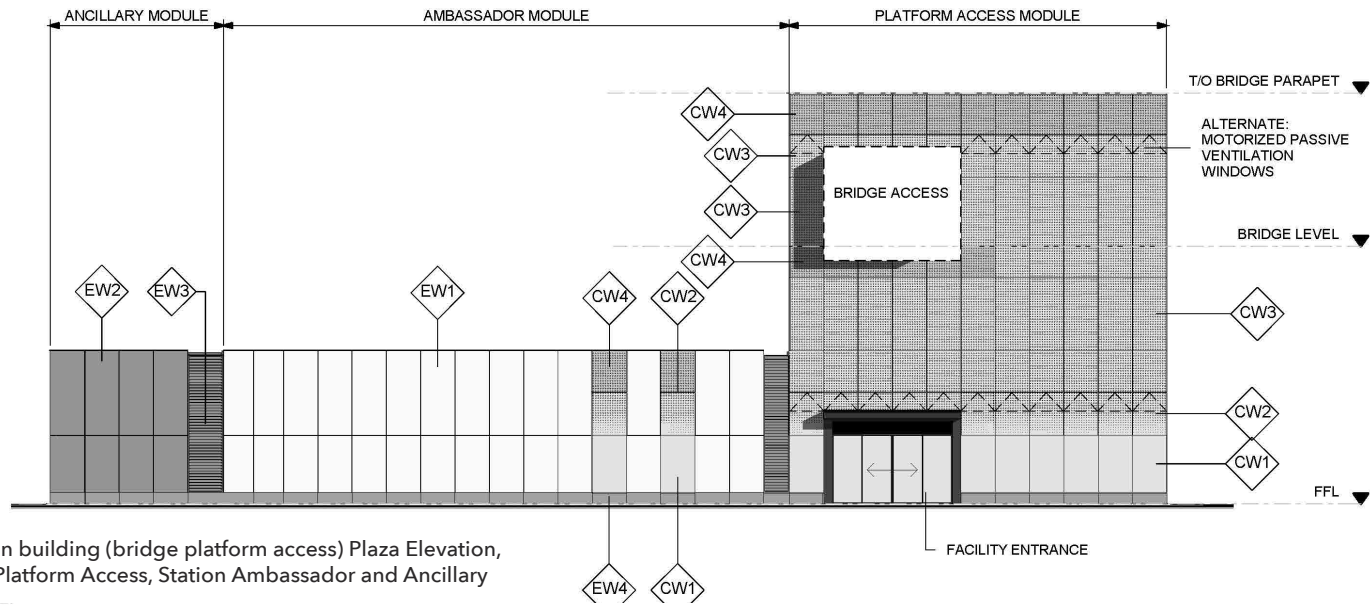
Staffed Station building (bridge platform access) Plaza Elevation, showing exterior finishes, Platform Access, Station Ambassador and Ancillary Modules
